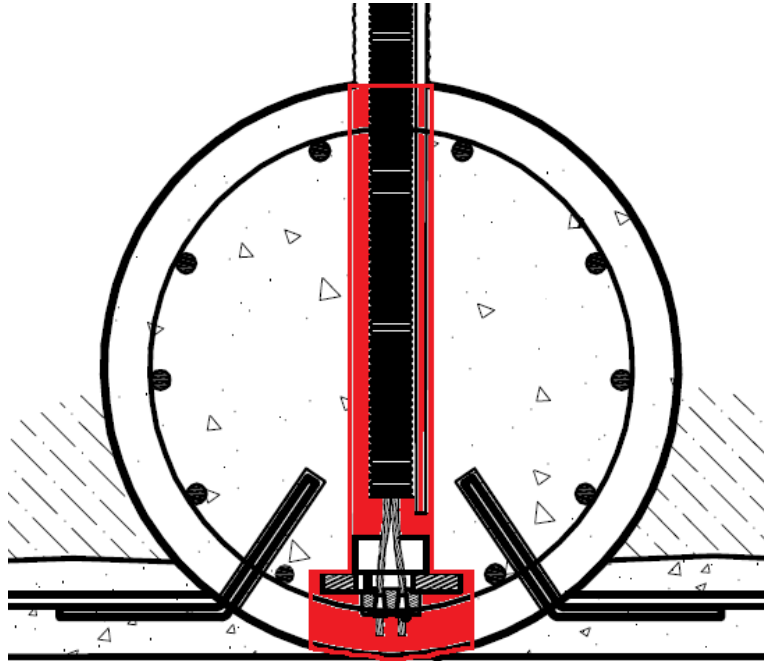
Plan view of a drilled shaft with a strand anchor installed; trumpet outline is in red
